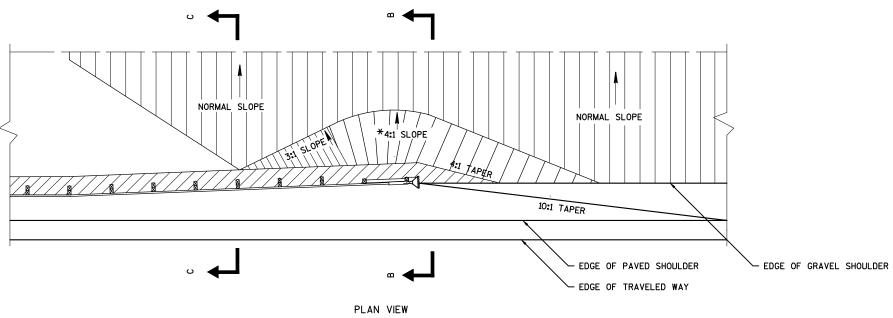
### DETAIL FOR ASPHALTIC SHOULDER AT BEAM GUARD
